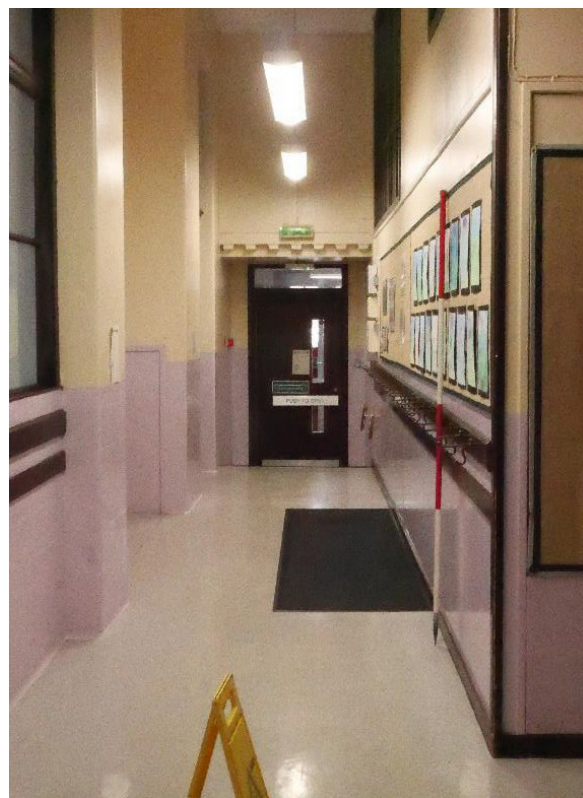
General view of corridor Room 0/1, looking north-west (© Derek Hall 2023)
